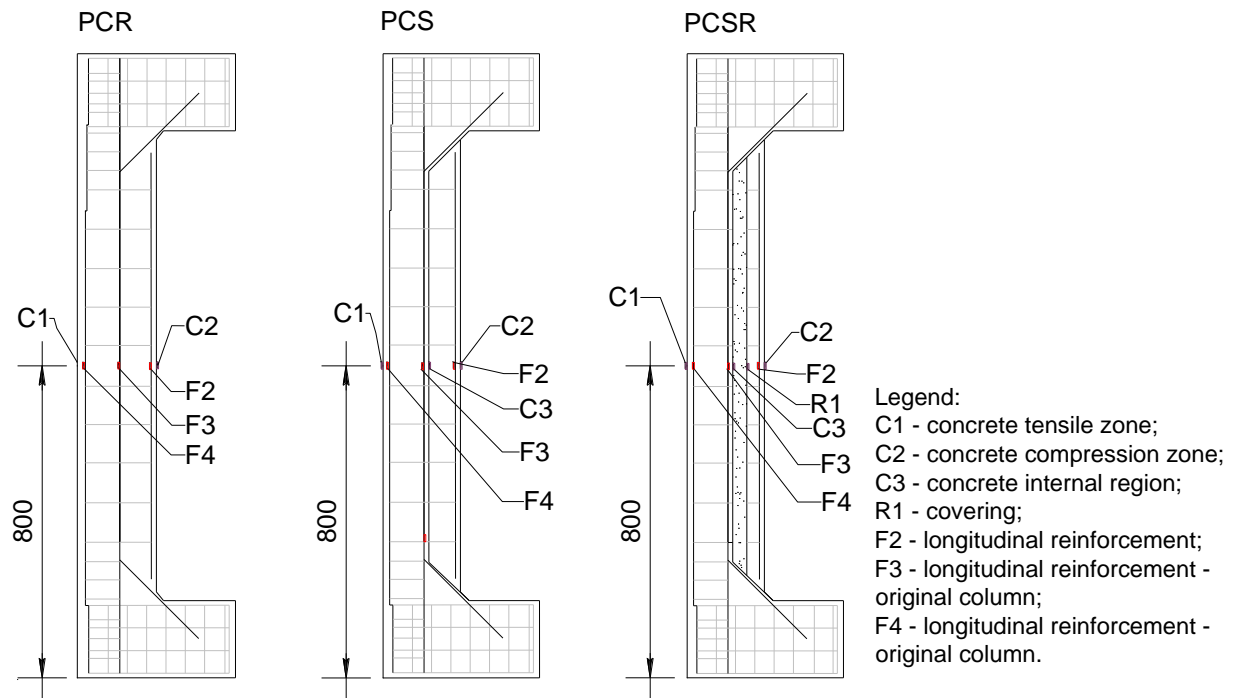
Extensometers on the rebar and concrete of the compression zone strengthened columns.
